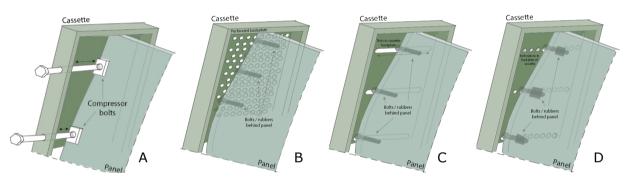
Panel fastening options. A) adjustable compression bolts, B) perforated back with bolts and C) slotted bolts that can be adjusted in their position and push the panel against the side of the cassette, D) combination of B and C, with rubbers.
